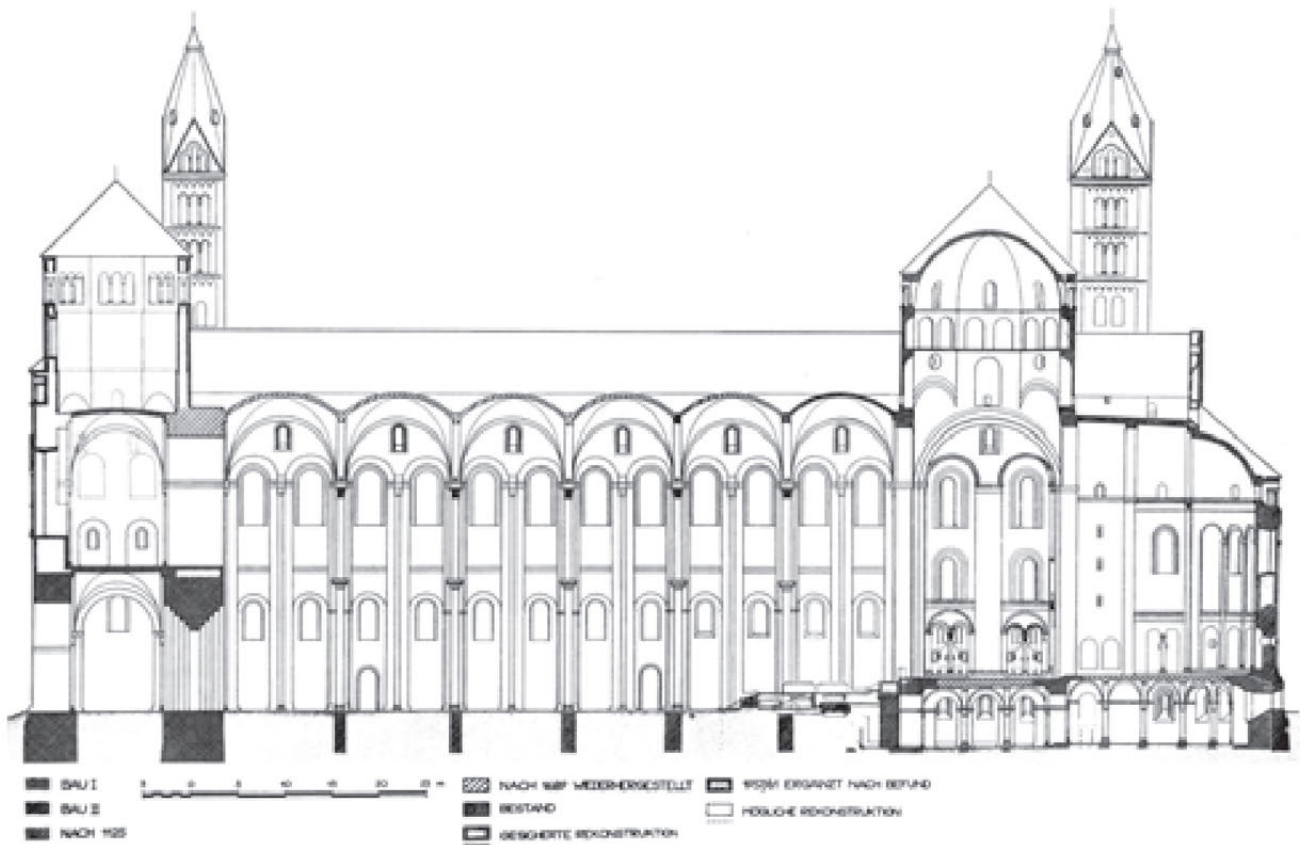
Speyer Cathedral, longitudinal section, c. 1130 (reconstruction Hans Erich KUBACH & Walter HAAS)
